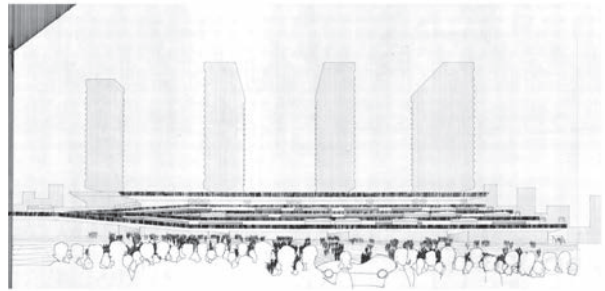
ELEVATION OF SECOND PROPOSAL 1965
